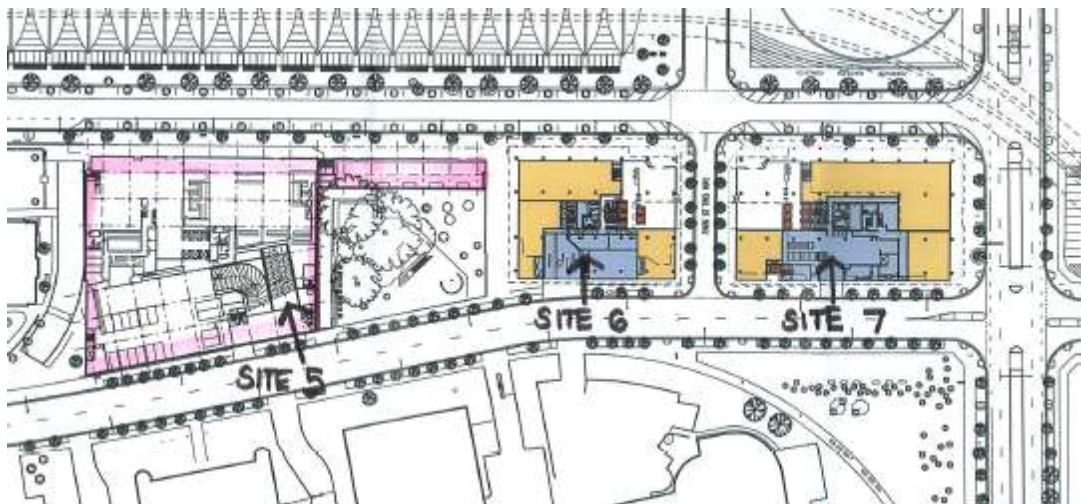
Site Plan indicating extent of site encompassed by original approval.
